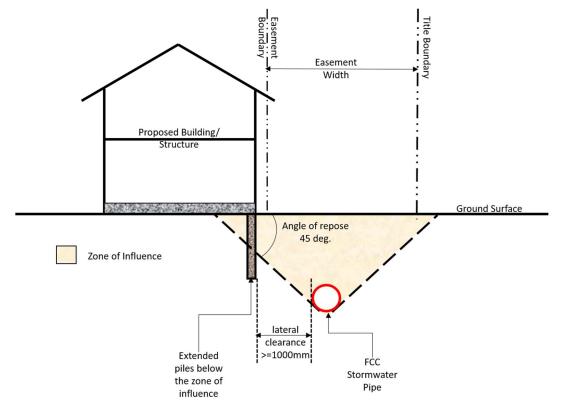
Section through building and stormwater pipe (lateral clearance ≥ 1000mm)
